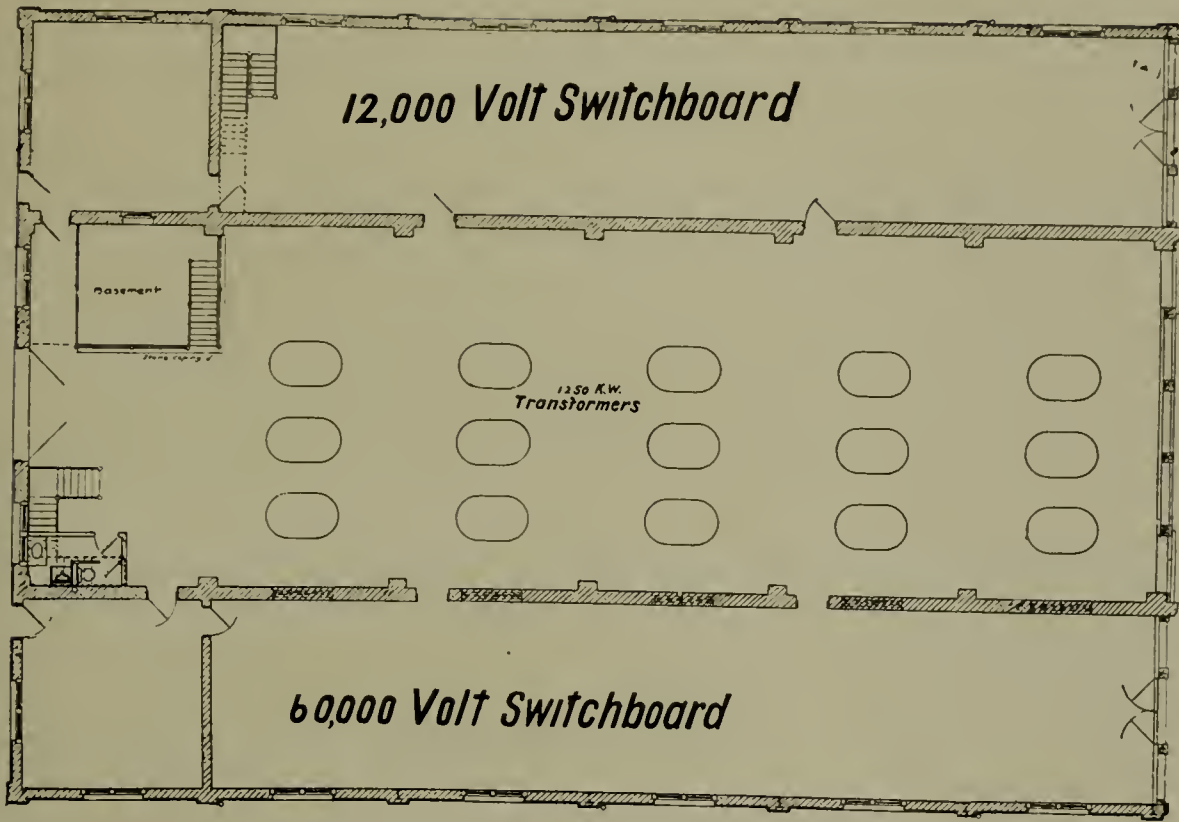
PLAN OF TRANSFORMER HOUSE, SHOWING ARRANGEMENT OF EQUIPMENT
